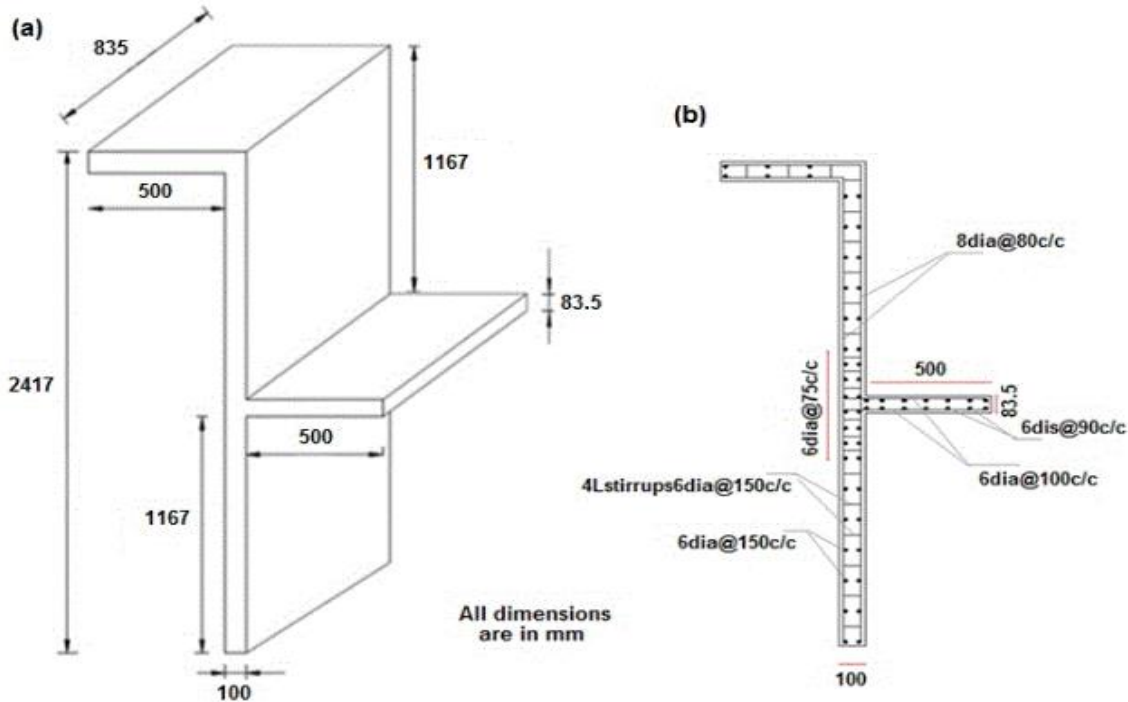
(a) Geometry of test units; (b) Reinforcement details of the test units under experiment set up (Source:[27])
